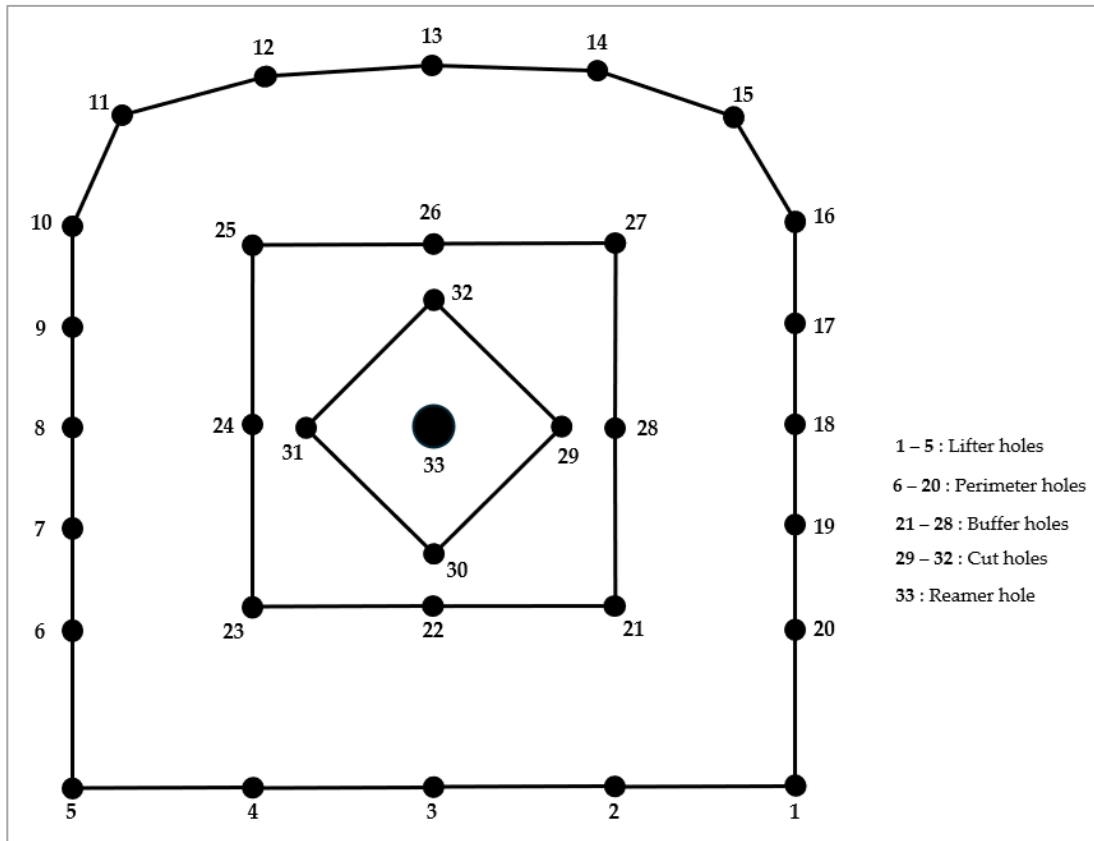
Proposed drilling layout for a 4.0 m x 4.0 m drive size at Tulawaka Gold Mine.
